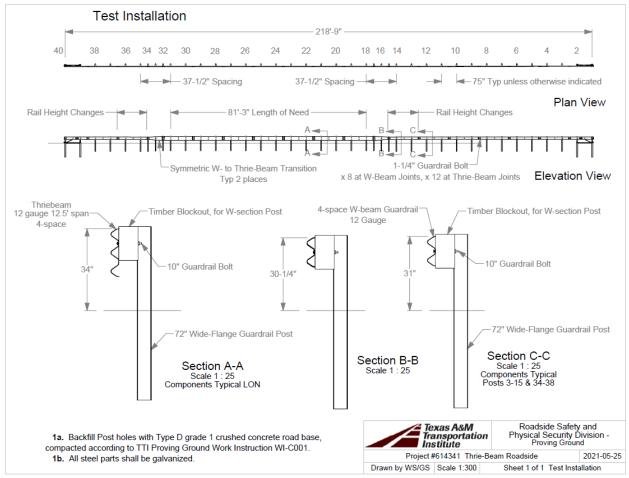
Plan View and Elevation View of Roadside TGS Installation.
